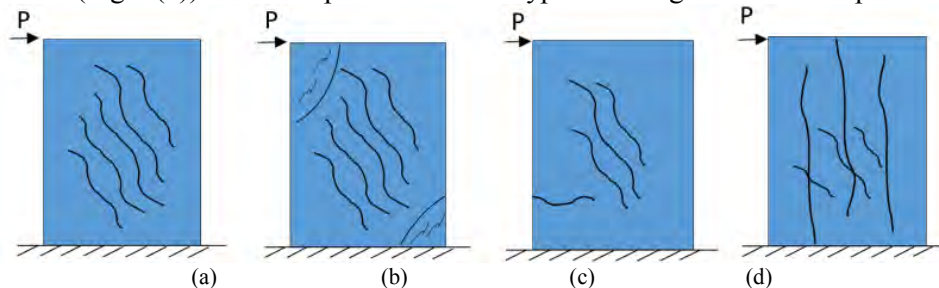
Various failure modes in a GFRG panel subjected to shear: (a) Diagonal cracking in unfilled panel, (b) End crushing in unfilled panel, (c) Tensile breaking in concrete-filled panels with starter bars, (d) Longitudinal cracking in concrete-filled panels.
